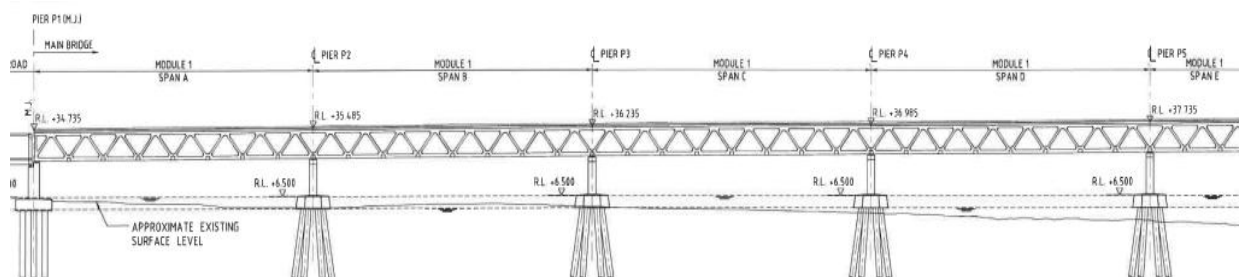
Typical Long Section of the Padma Multipurpose Bridge
